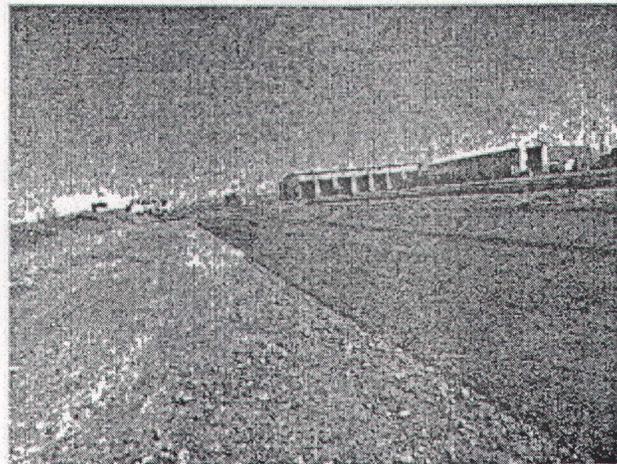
Area of excavated surface with a geomembrane laid down between tracks 2 and 3. The picture is looking north towards the intermodal wash building.
